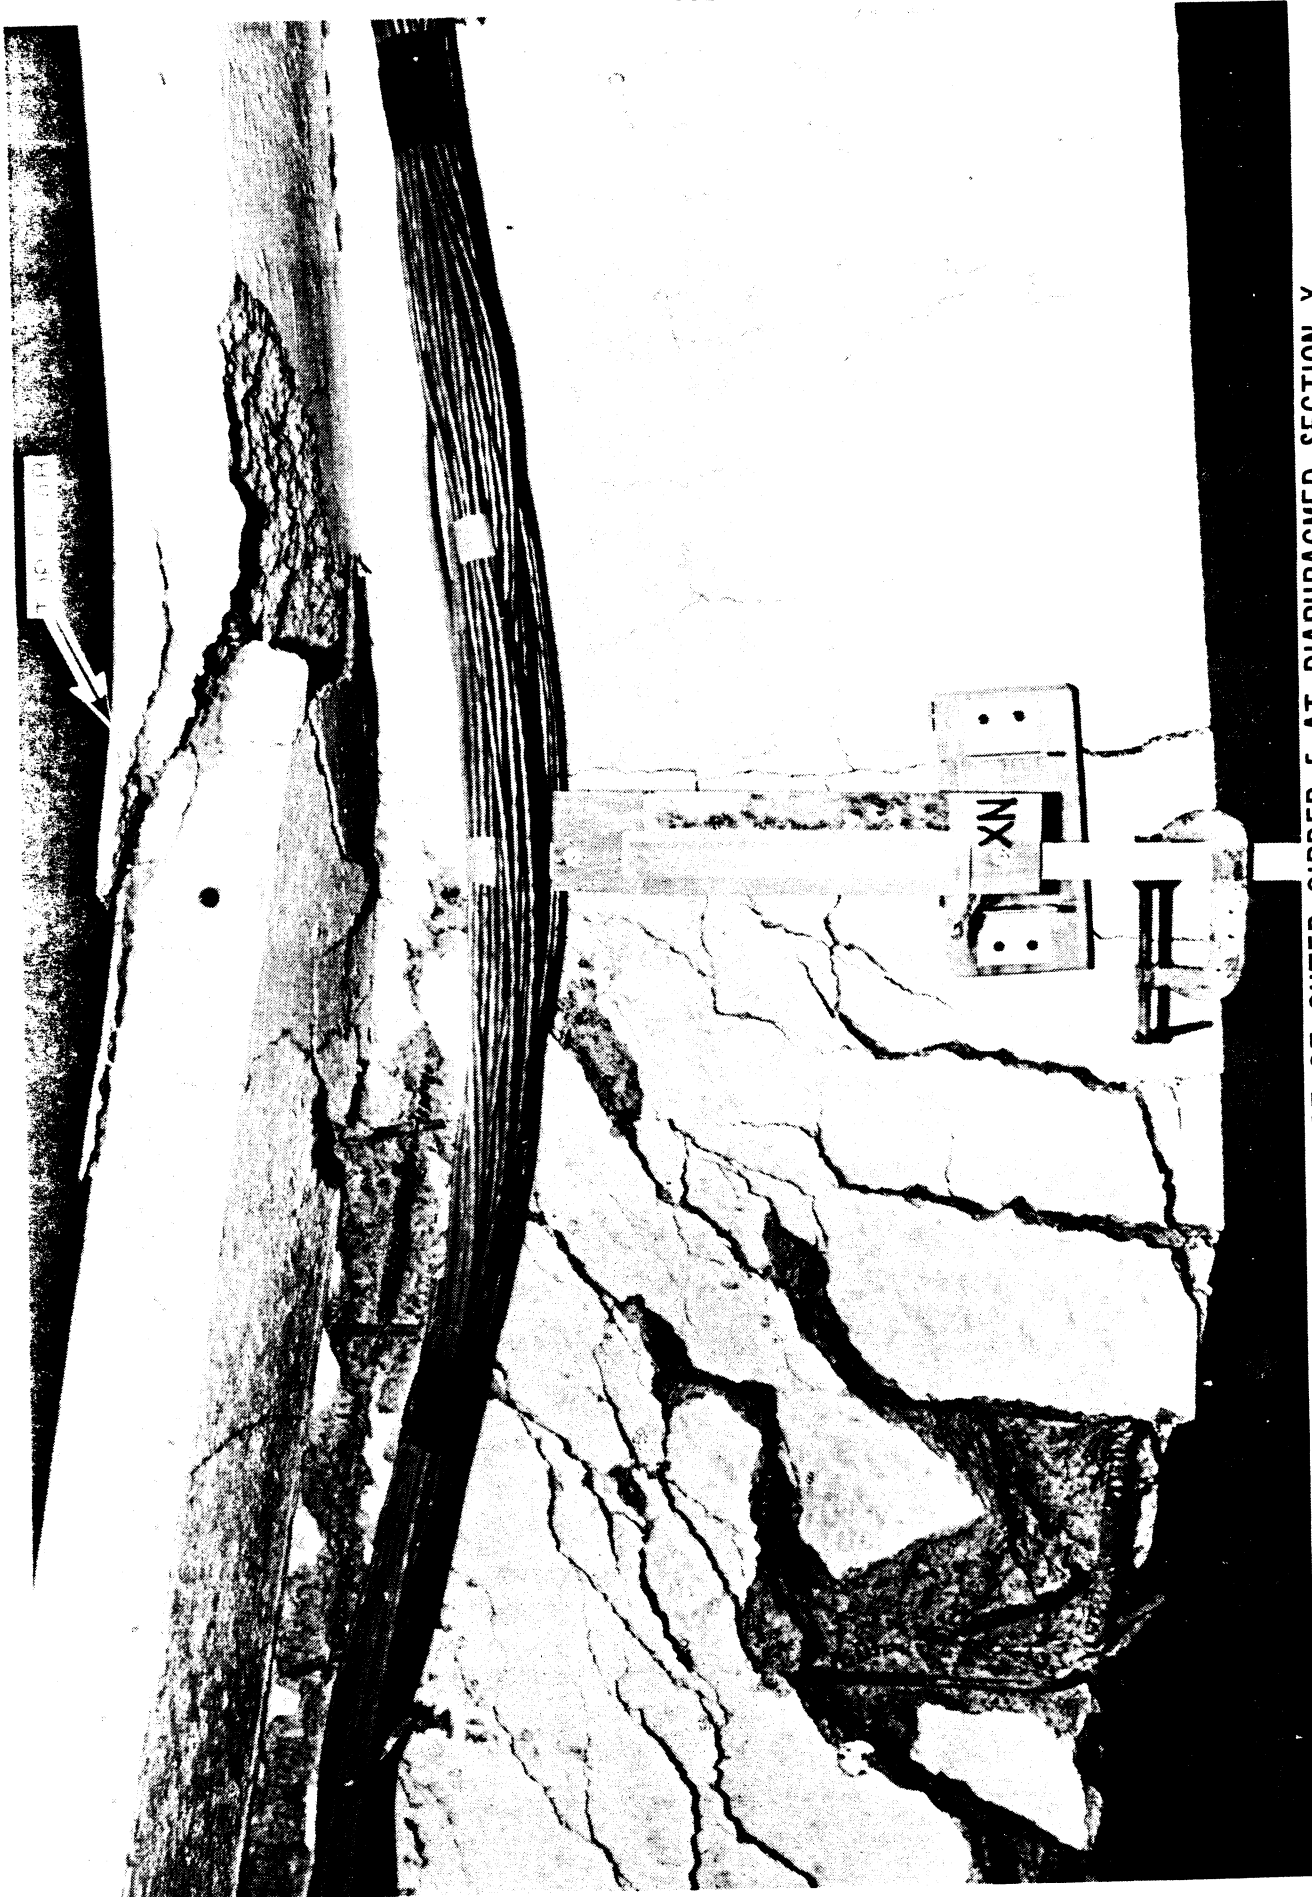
CLOSEUP OF FAILURE OF OUTER GIRDER 5 AT DIAPHRAGMED SECTION X
